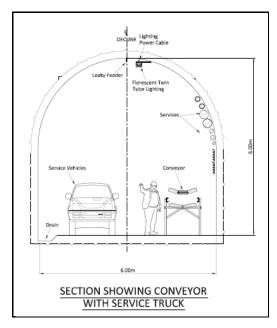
Schematic arrangement layouts of conveyor tunnel and service vehicles
